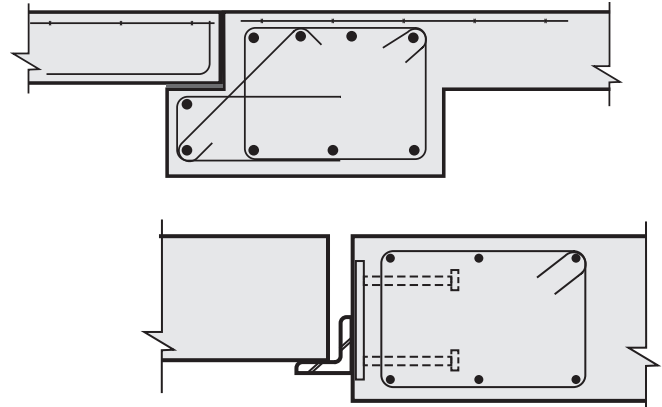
Examples of expansion joint details for PT construction. If required to maintain a diaphragm, reinforcing bars with slip connectors can be included and grouted after initial shrinkage is complete.
